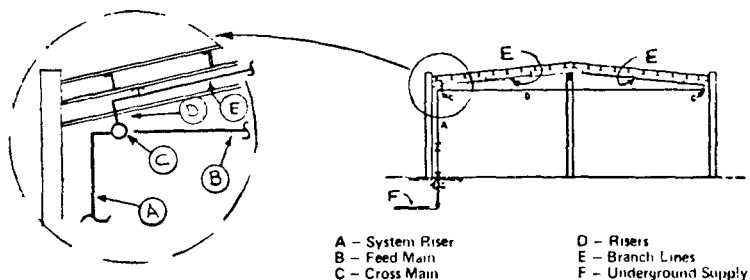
Building Elevation Showing Parts of Sprinkler Piping System.
